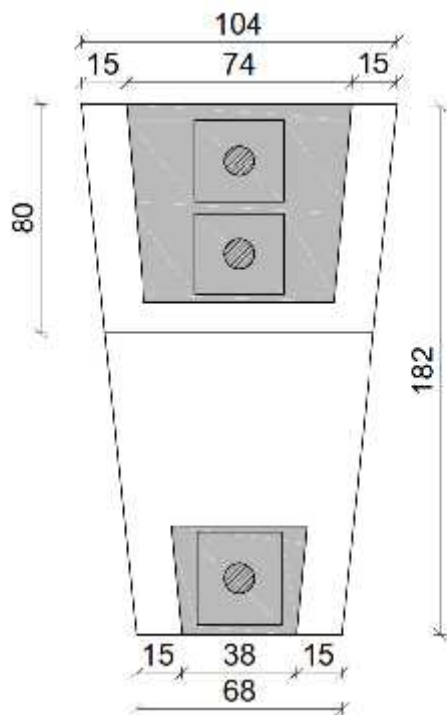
End section of the longitudinal beams / Sezione terminale delle travi longitudinali
